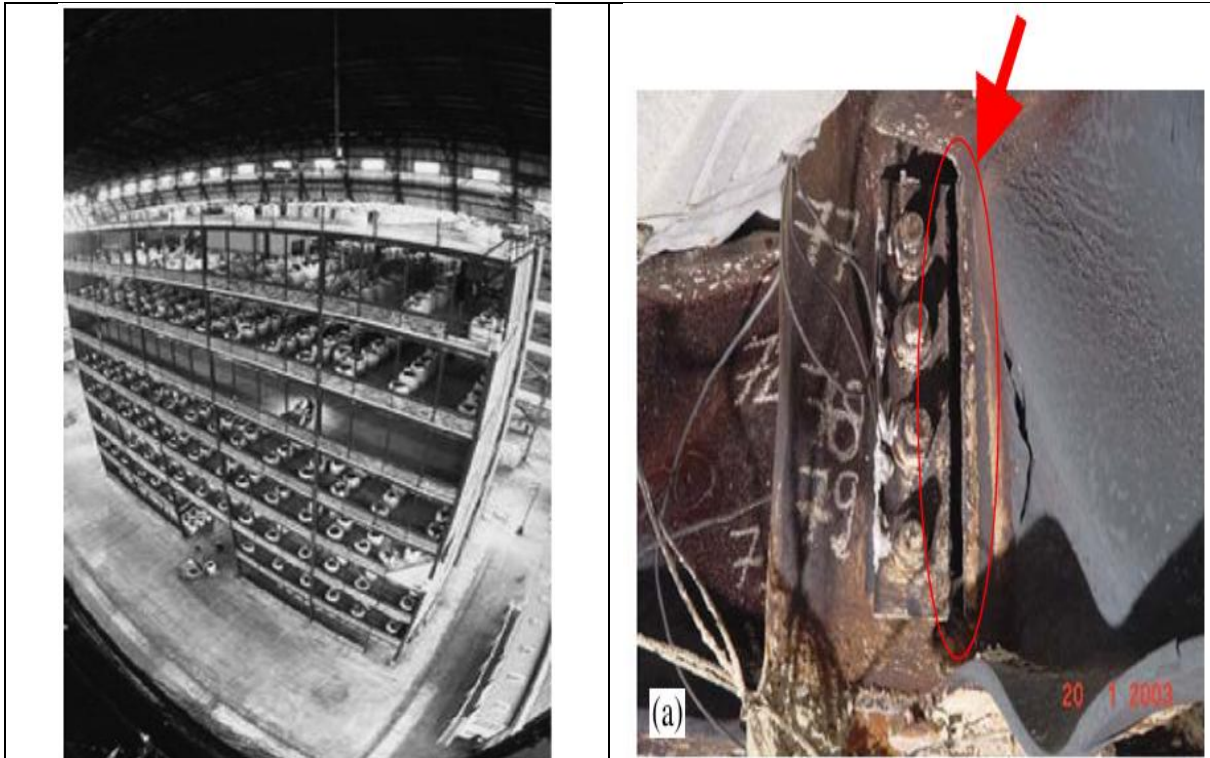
Full-scale structure fire test at Cardington Laboratory [\[69\]](#)
